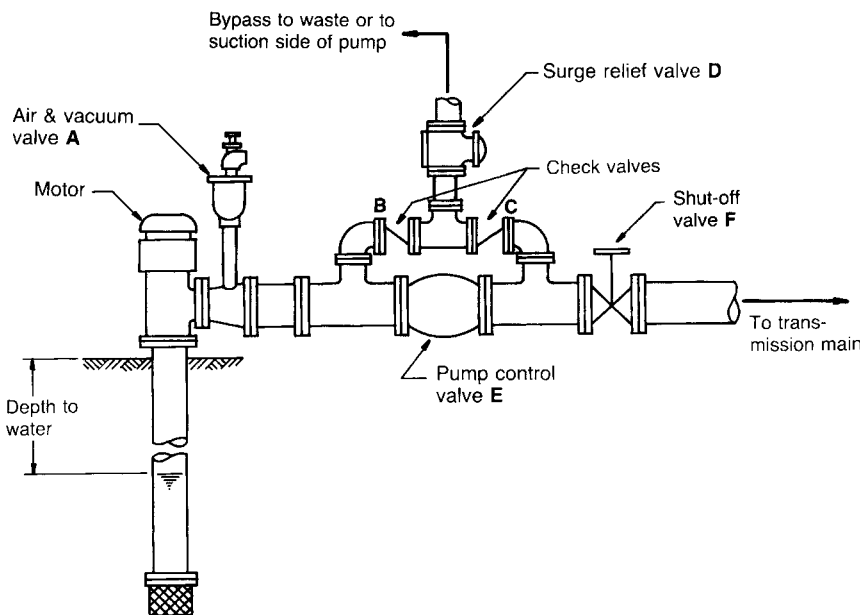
Upstream and downstream bypass of a pump-controlled valve. After Hy/Con Valve Co. [5].
